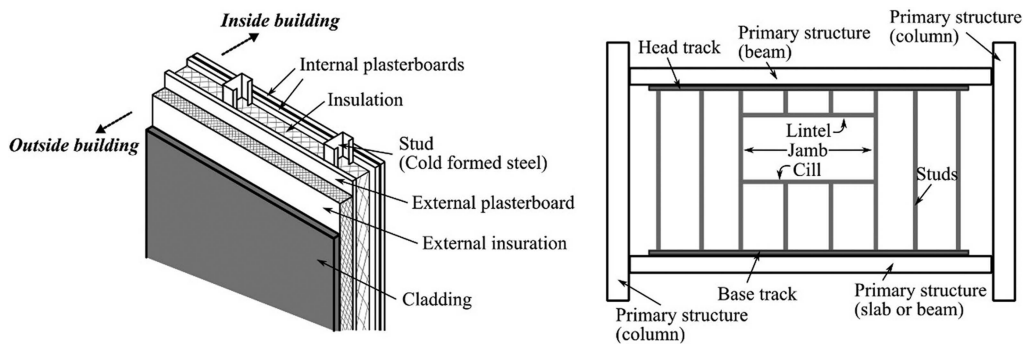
Exterior infill wall: (left) notations of infill wall components; (right) notations of lightweight cold-formed steel members and surrounding primary structure.
